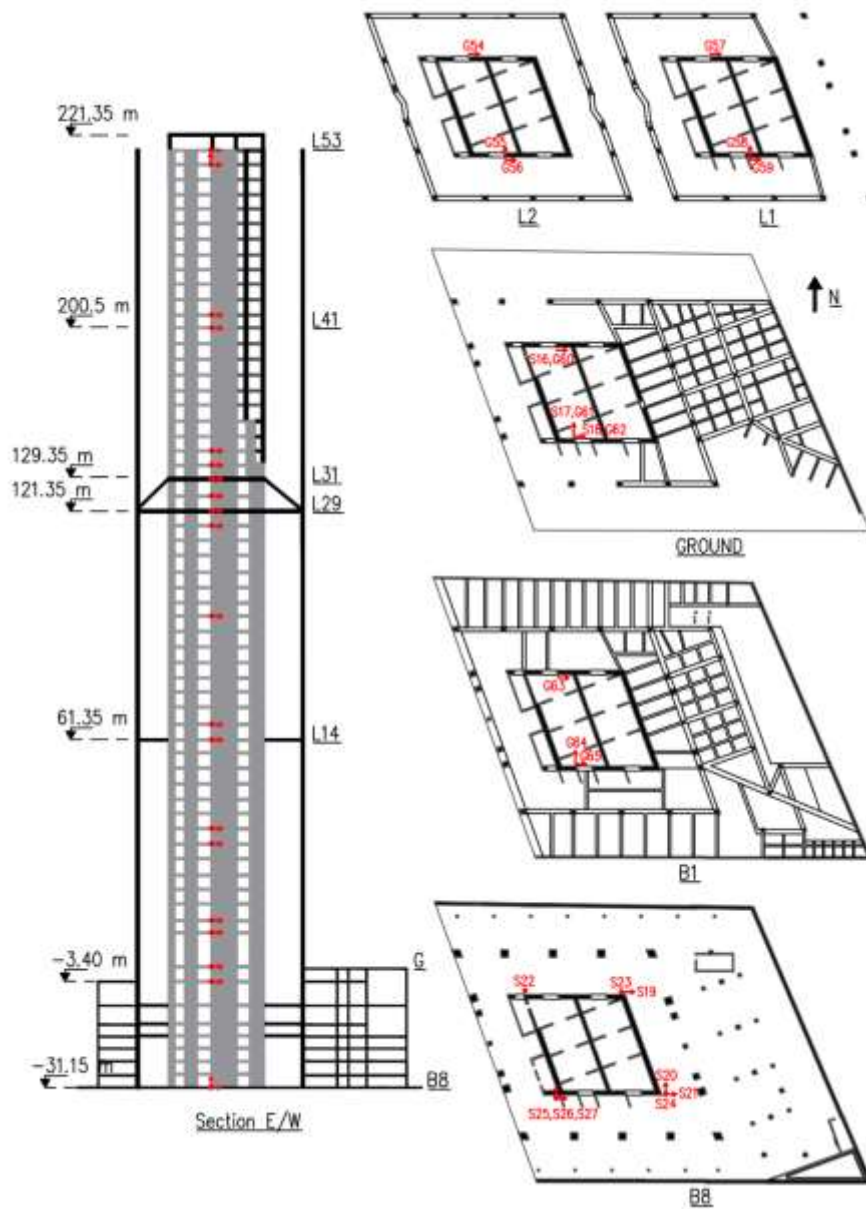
Vertical section and plan views of the floors where accelerometers are deployed through the building.
